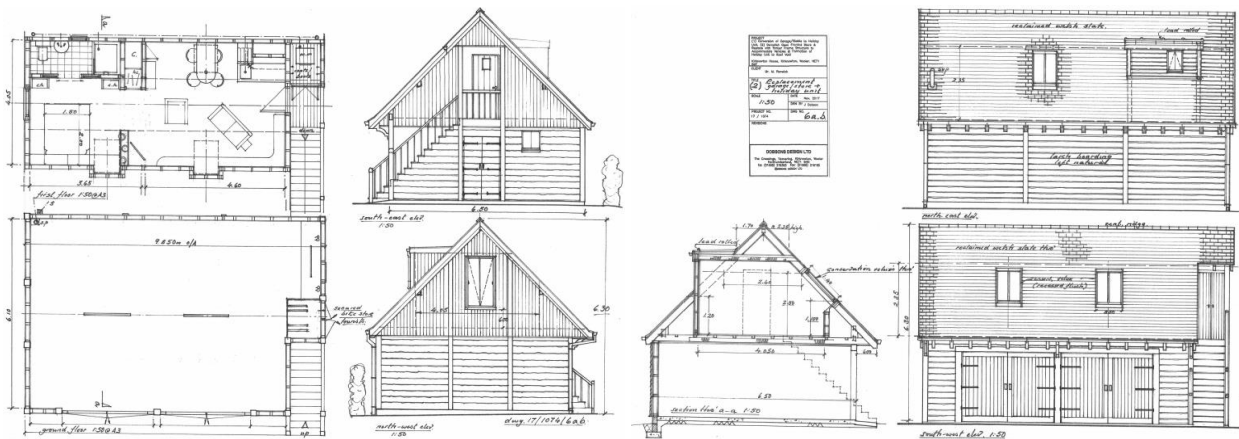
New Garage / Holiday Unit: Plans and Elevations
